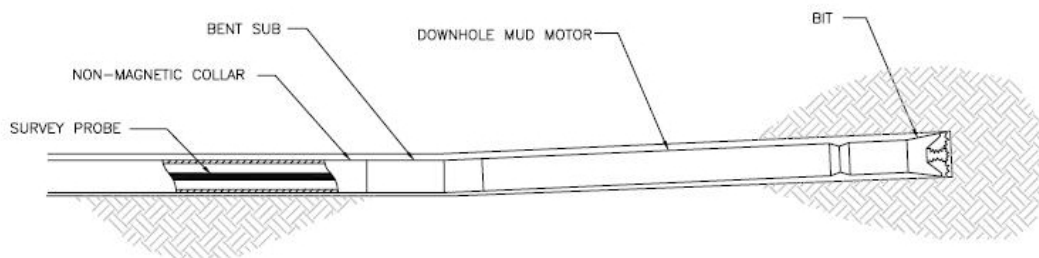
Bottom Hole Assembly Wireline Tracking System (HDD Consortium 2001)
